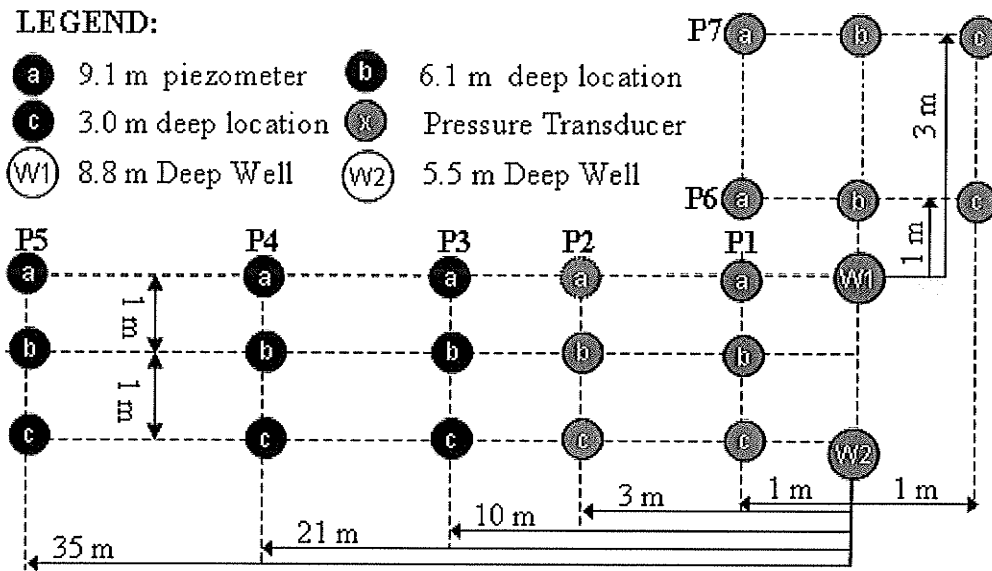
Plan view schematic of extraction well and piezometer layout (not to scale)
